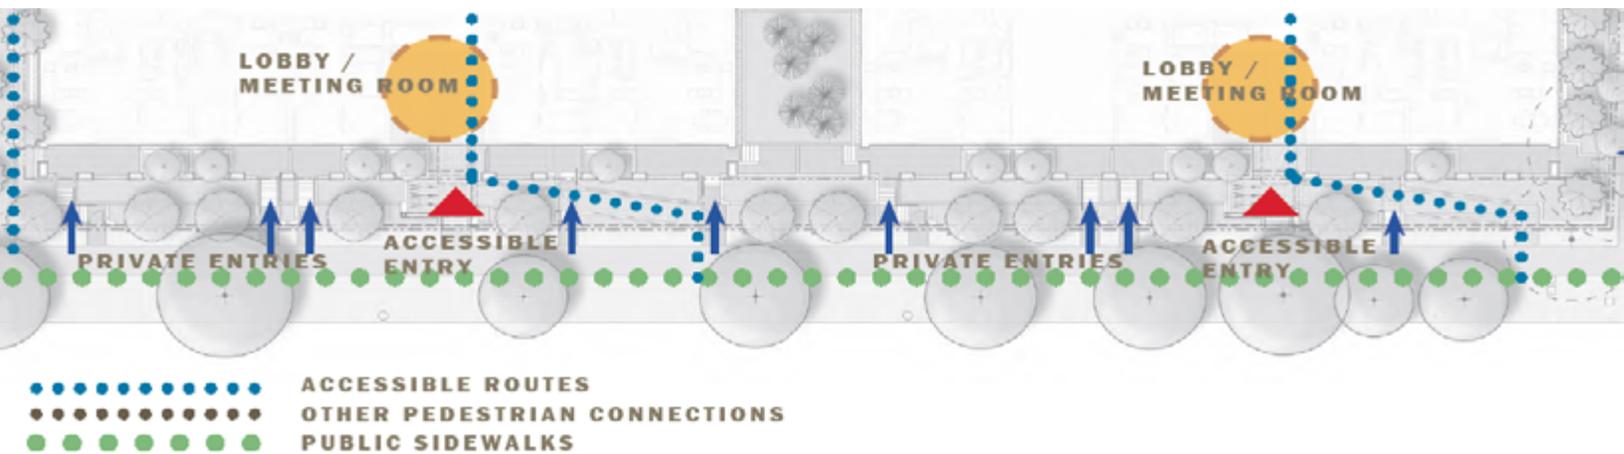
| Cambie Street frontage set back from the sidewalk, enhanced by a row of trees and layered planting
